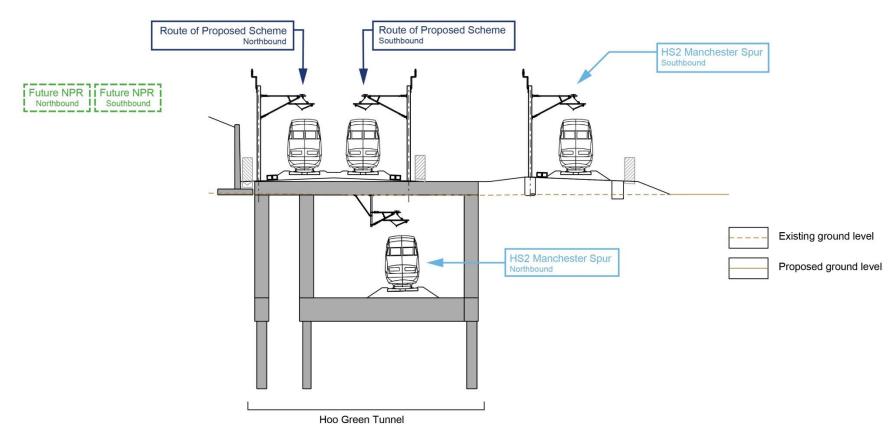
Hoo Green box structure and Hoo Green tunnel section B-B
